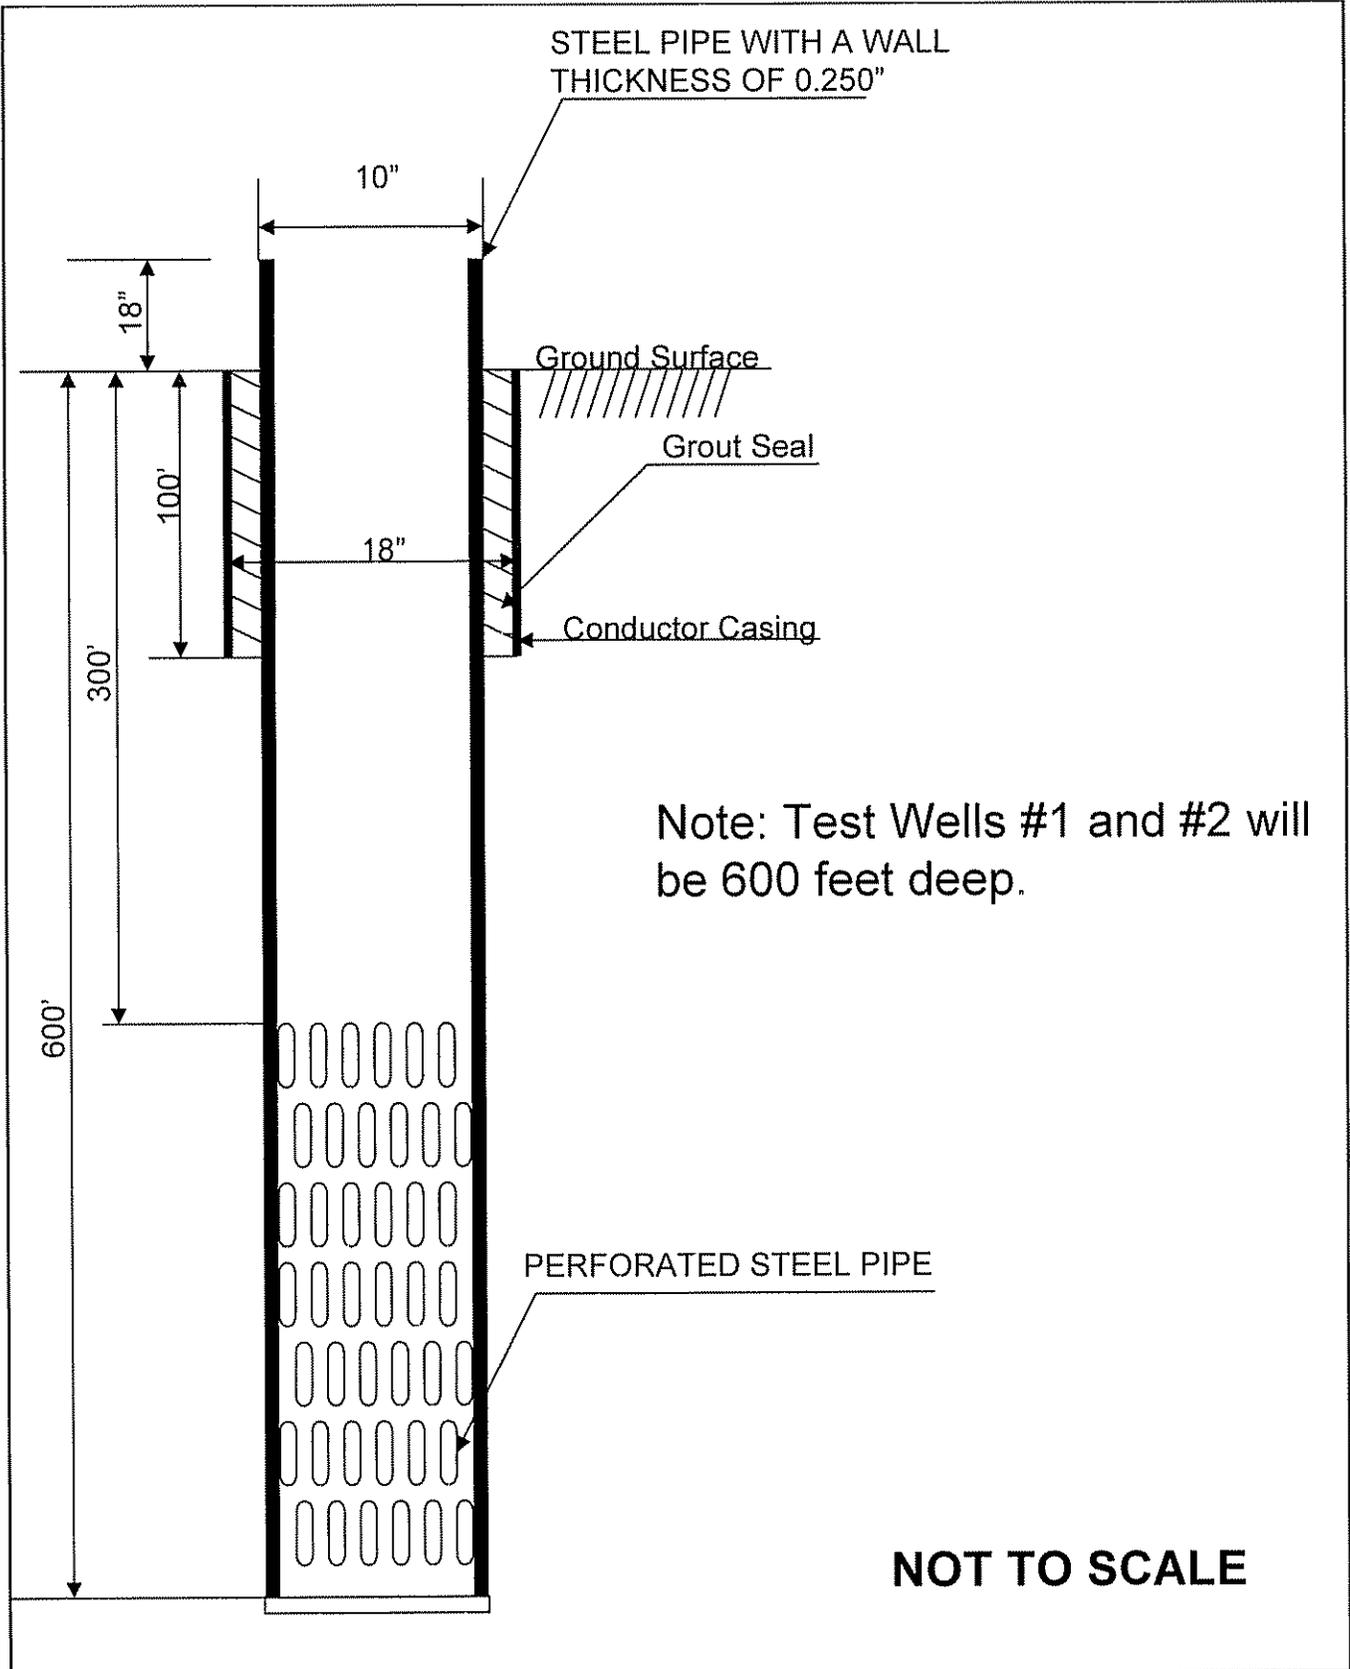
WELL DESIGN – CABLE TOOL DRILLING METHOD
